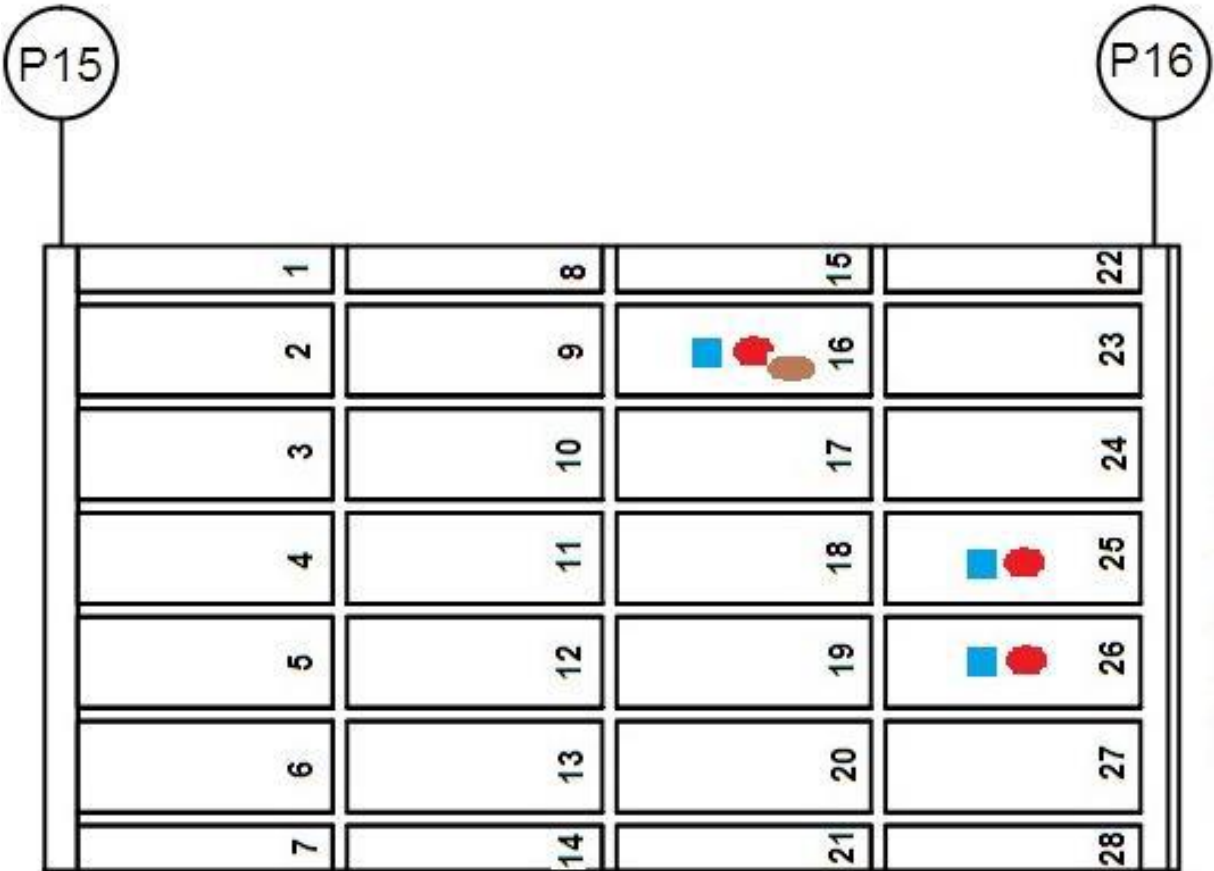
Test conducted at various locations between Pier P15 and Pier P16
